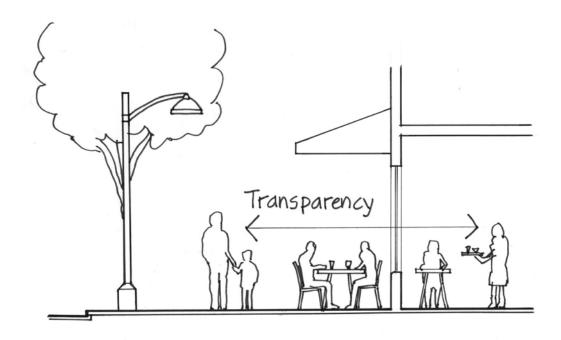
Active, transparent ground floor facades for commercial buildings, with visibility into interiors from the park and/or adjacent streets
